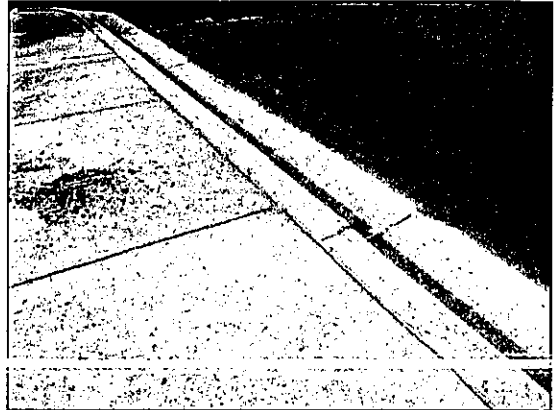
Typical displaced concrete components where a difference in elevation between the components has created a potential trip hazard.
